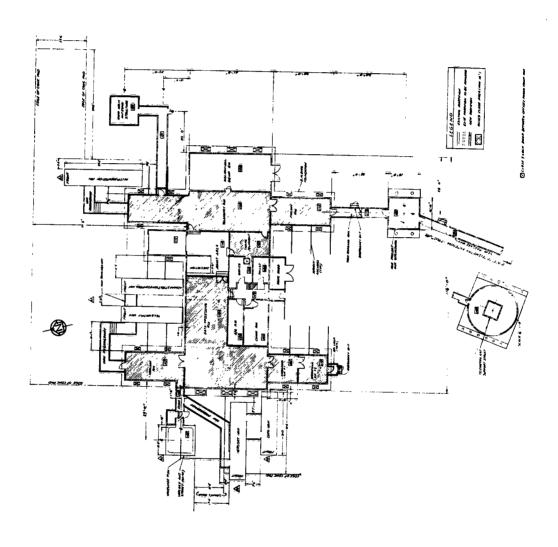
Floor Plan, Building S-1824, Multi-Satellite Augmentation, TTS
